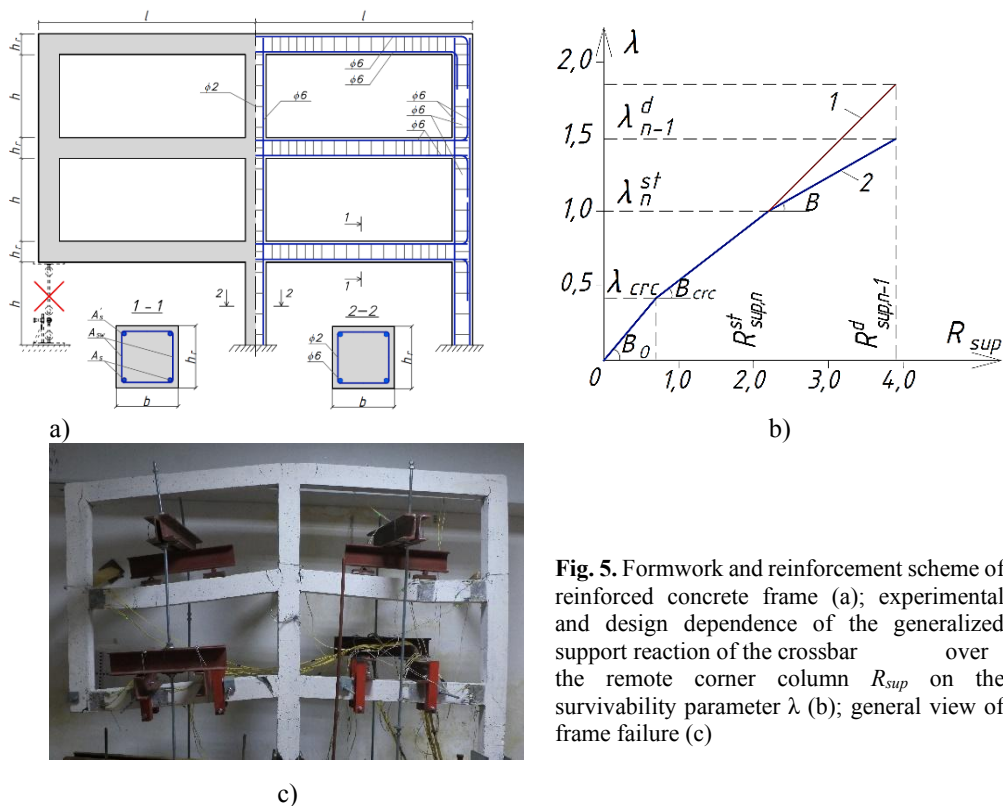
Formwork and reinforcement scheme of reinforced concrete frame (a); experimental and design dependence of the generalized support reaction of the crossbar over the remote corner column R_{sup} on the survivability parameter λ (b); general view of frame failure (c)
